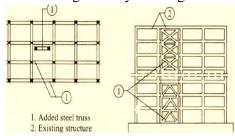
RC Building retrofitted by steel bracing IV. EARTHQUAKE METHODOLOGY 4.1 EARTHQUAKE LOADING
